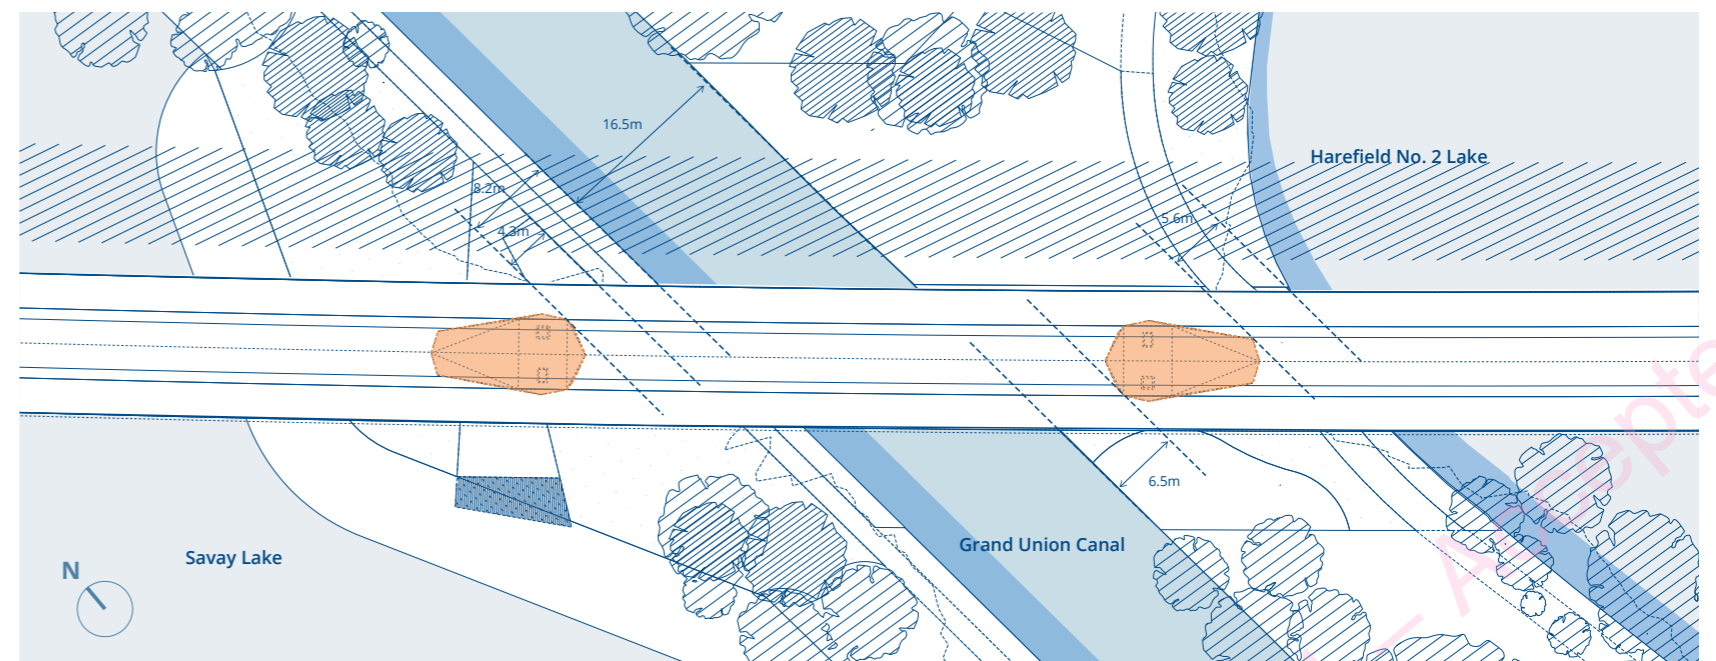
\_ Proposed plan - Grand Union Canal crossing
